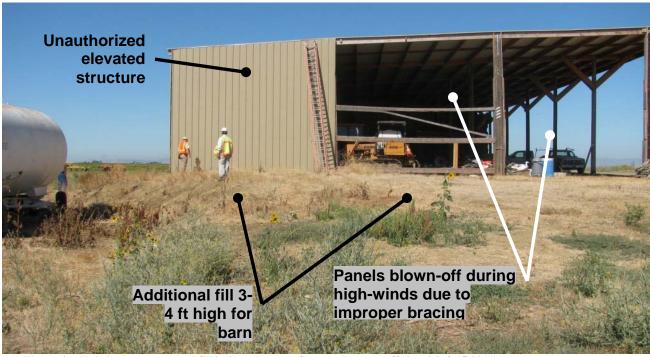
Existing structure and fill in Yolo Bypass (Source: Board staff site visit 8.15.2011)
